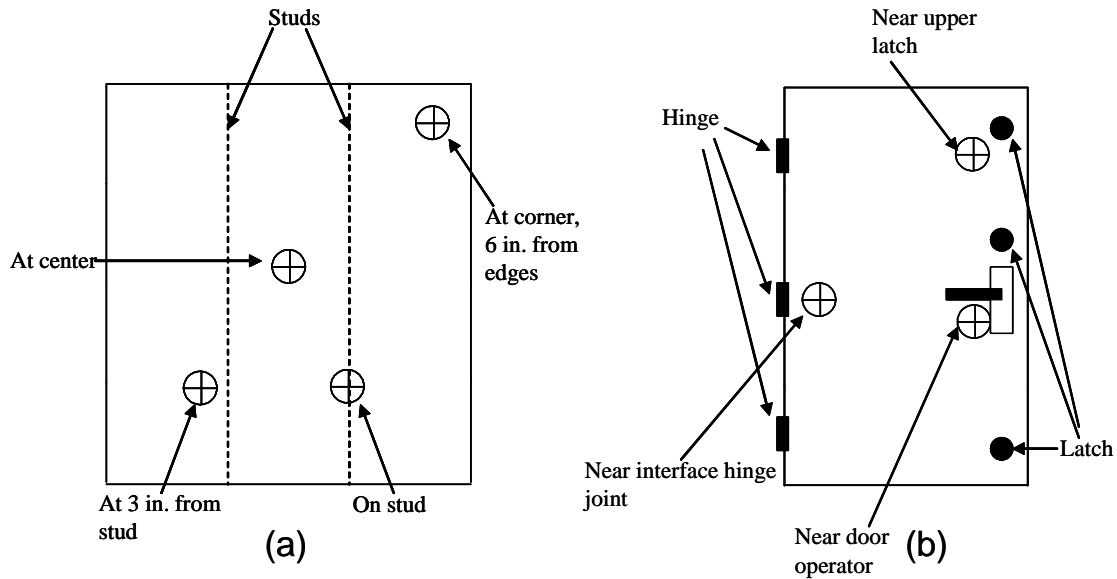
Impact locations for (a) a wall or roof panel, (b) a door assembly.
